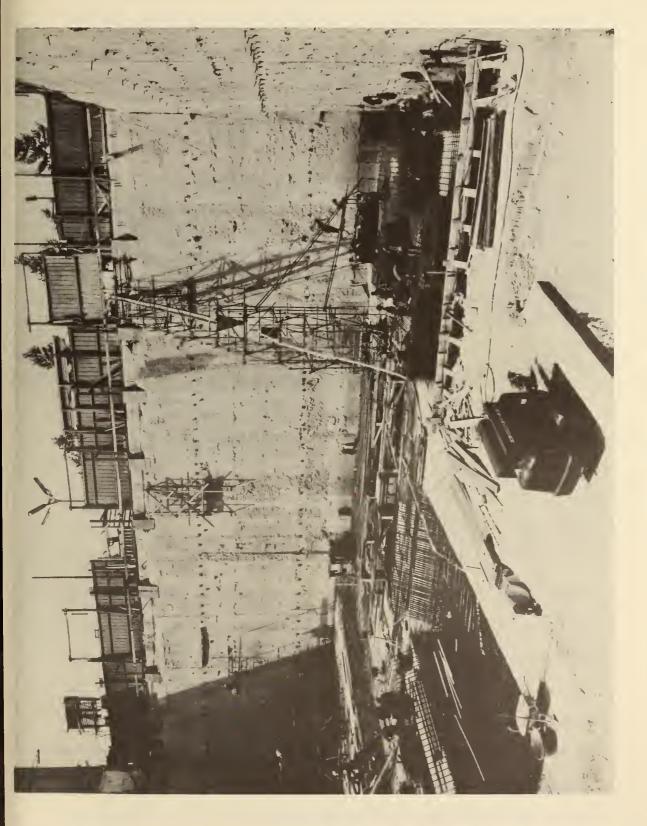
EXCAVATION BETWEEN SLURRY WALLS, Milan, Italy. (By permission of ICOS Corporation of America.)
